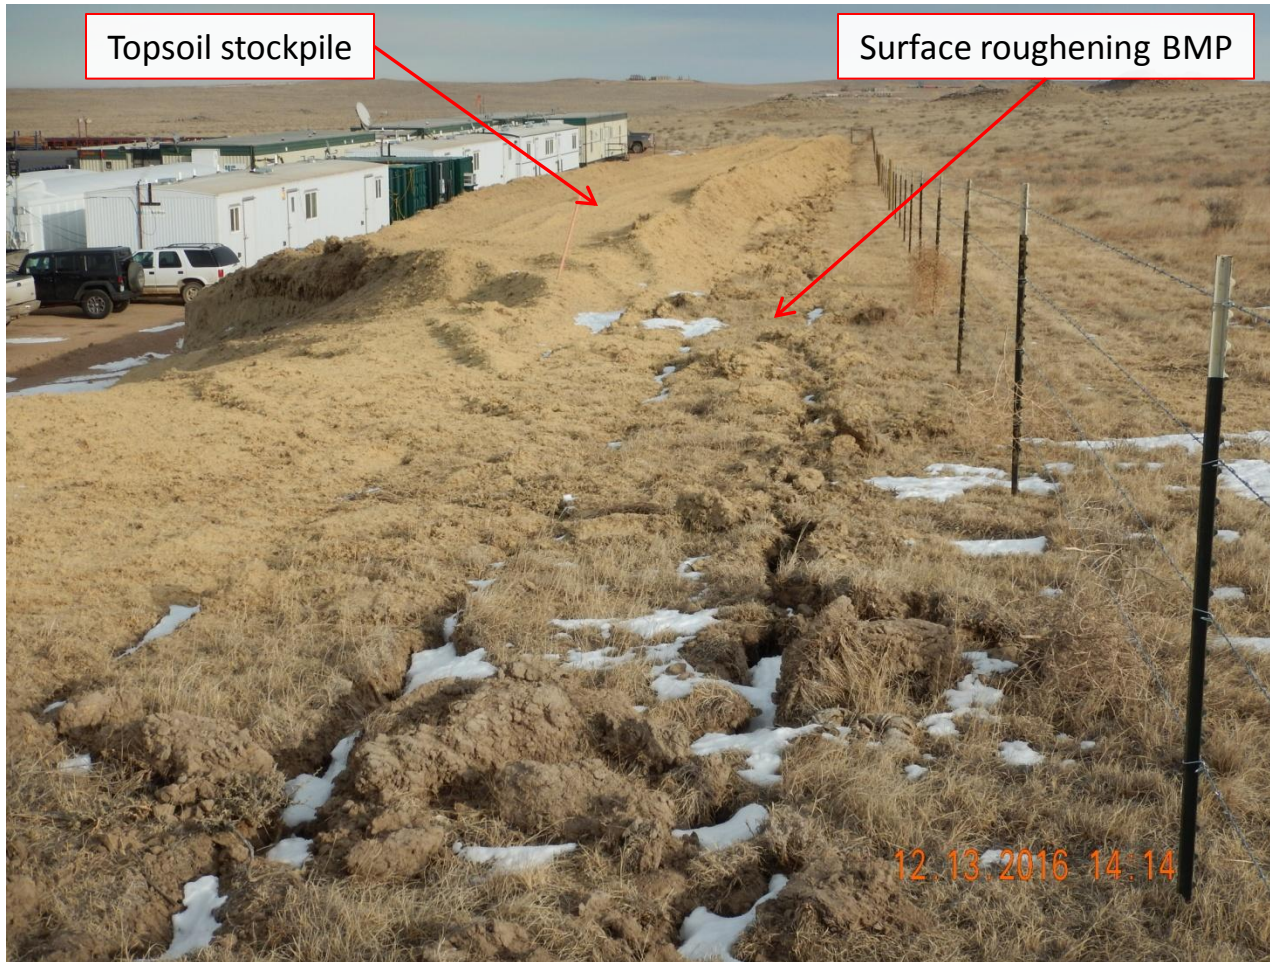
Photo taken from the southwest location, facing East. Surface roughening BMP installed along southern location with 3'-4' vegetated area between perimeter boundary.
